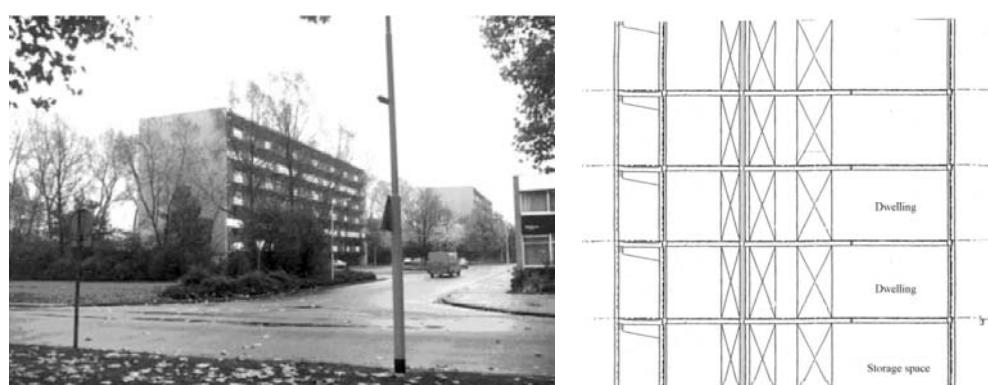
a) Existing building: elevation; b) cross section of the load-bearing structure
